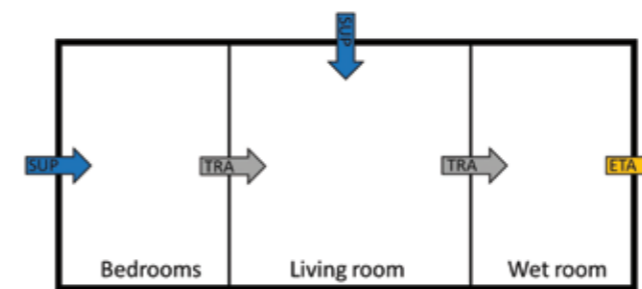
Layout of standard cascade ventilation ©J. Pichler GmbH
